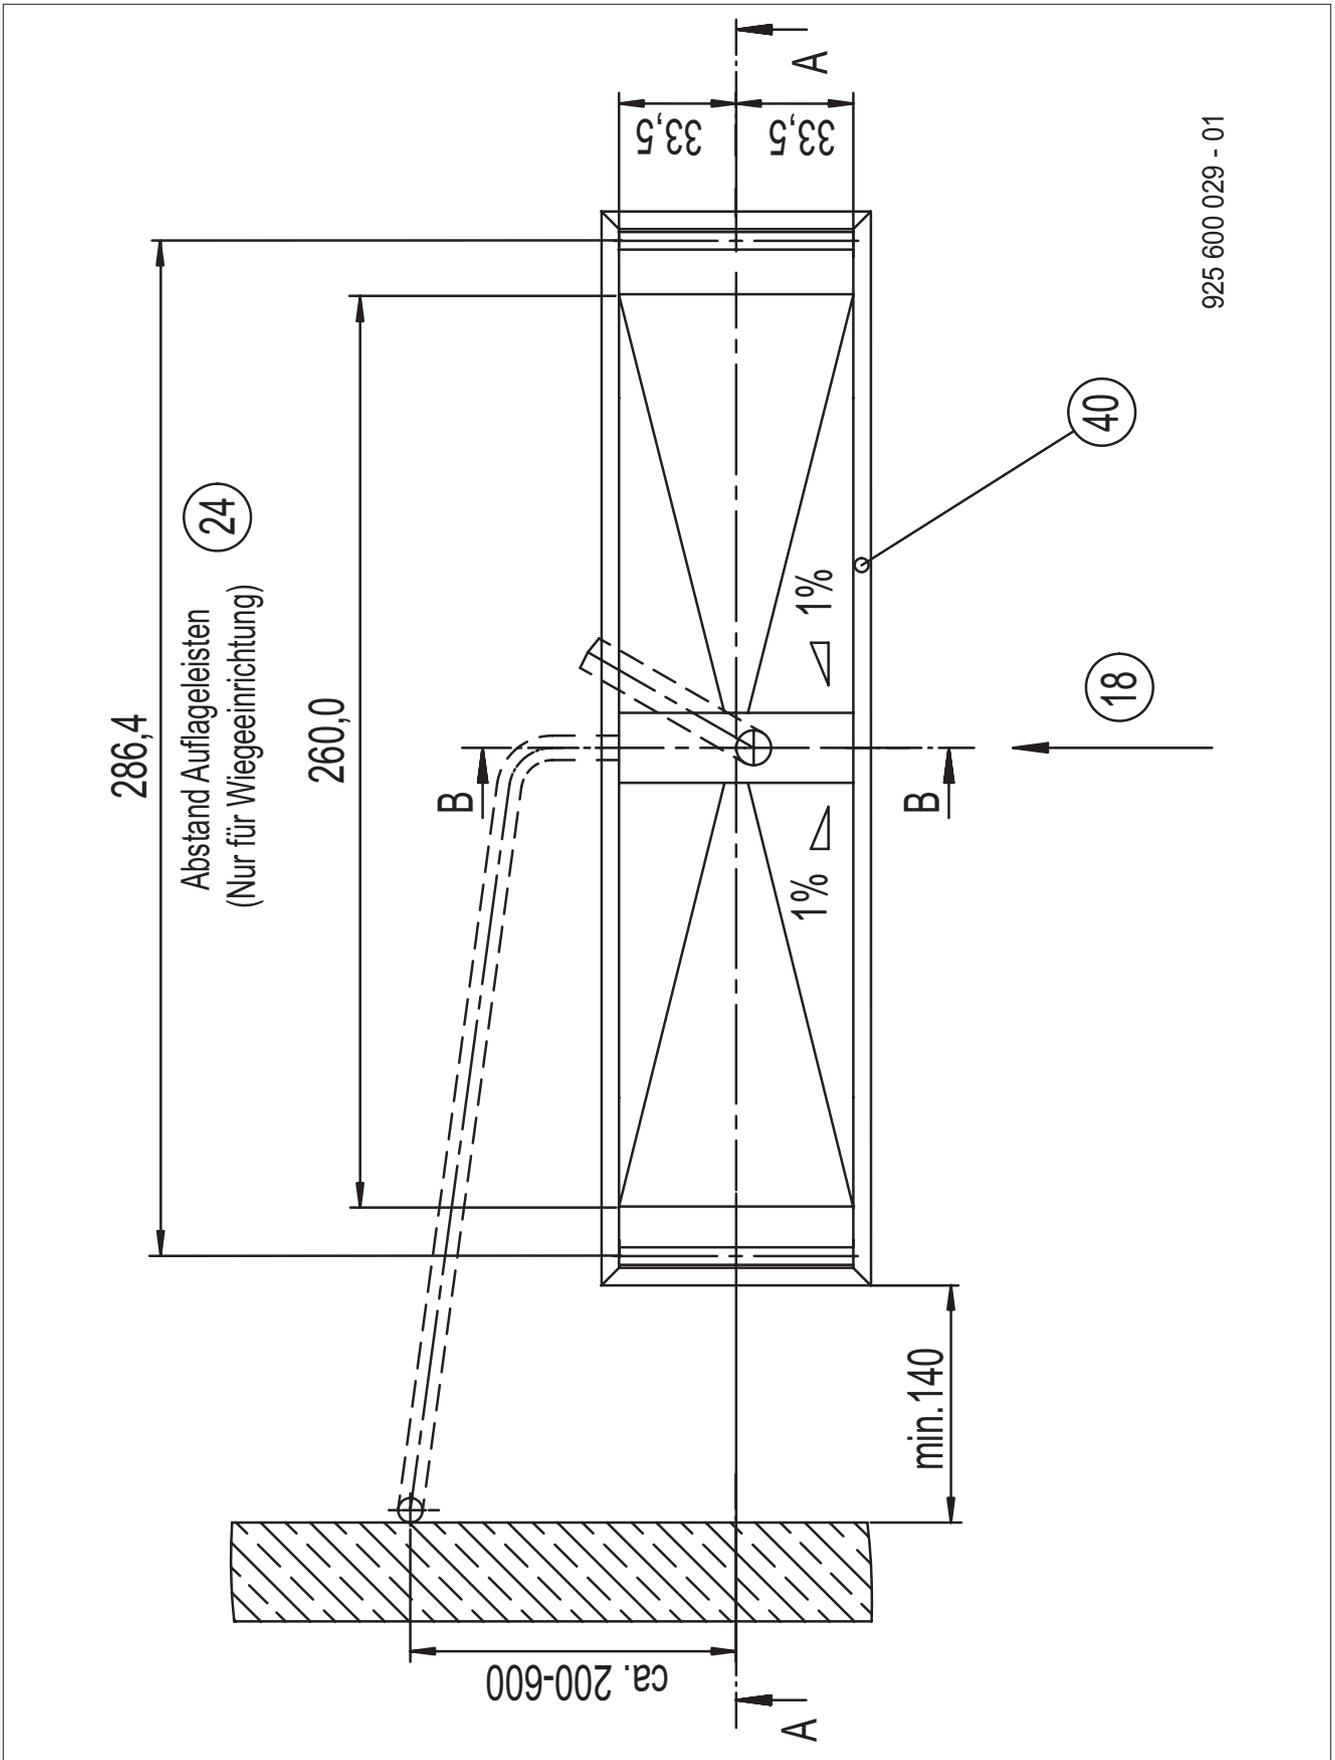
Plan of Pit BD 660 with wall bracket - Ground plan
